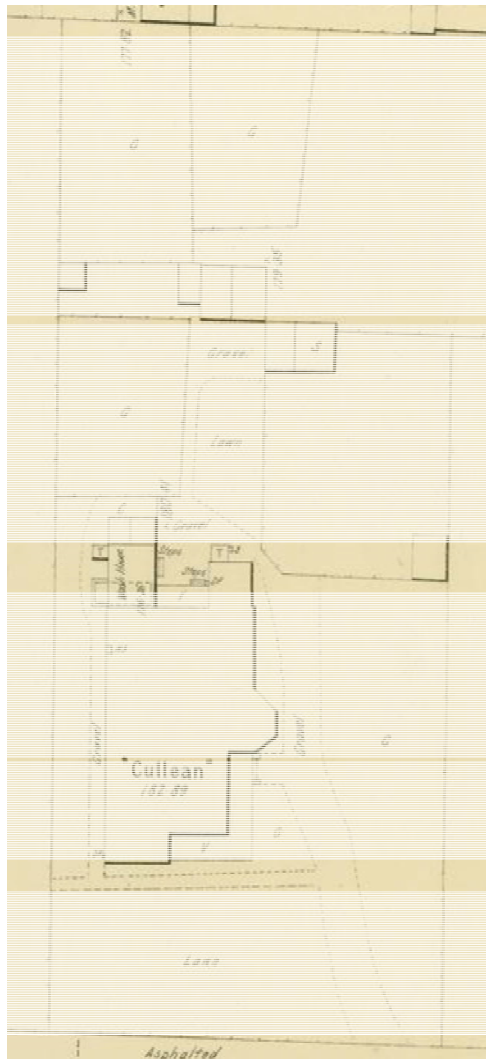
Extent of 'Cullean' in 1901, showing grounds and outbuildings, from MMBW Detail Plan. No. 997, Prabran, 1901 (source: SLV)
